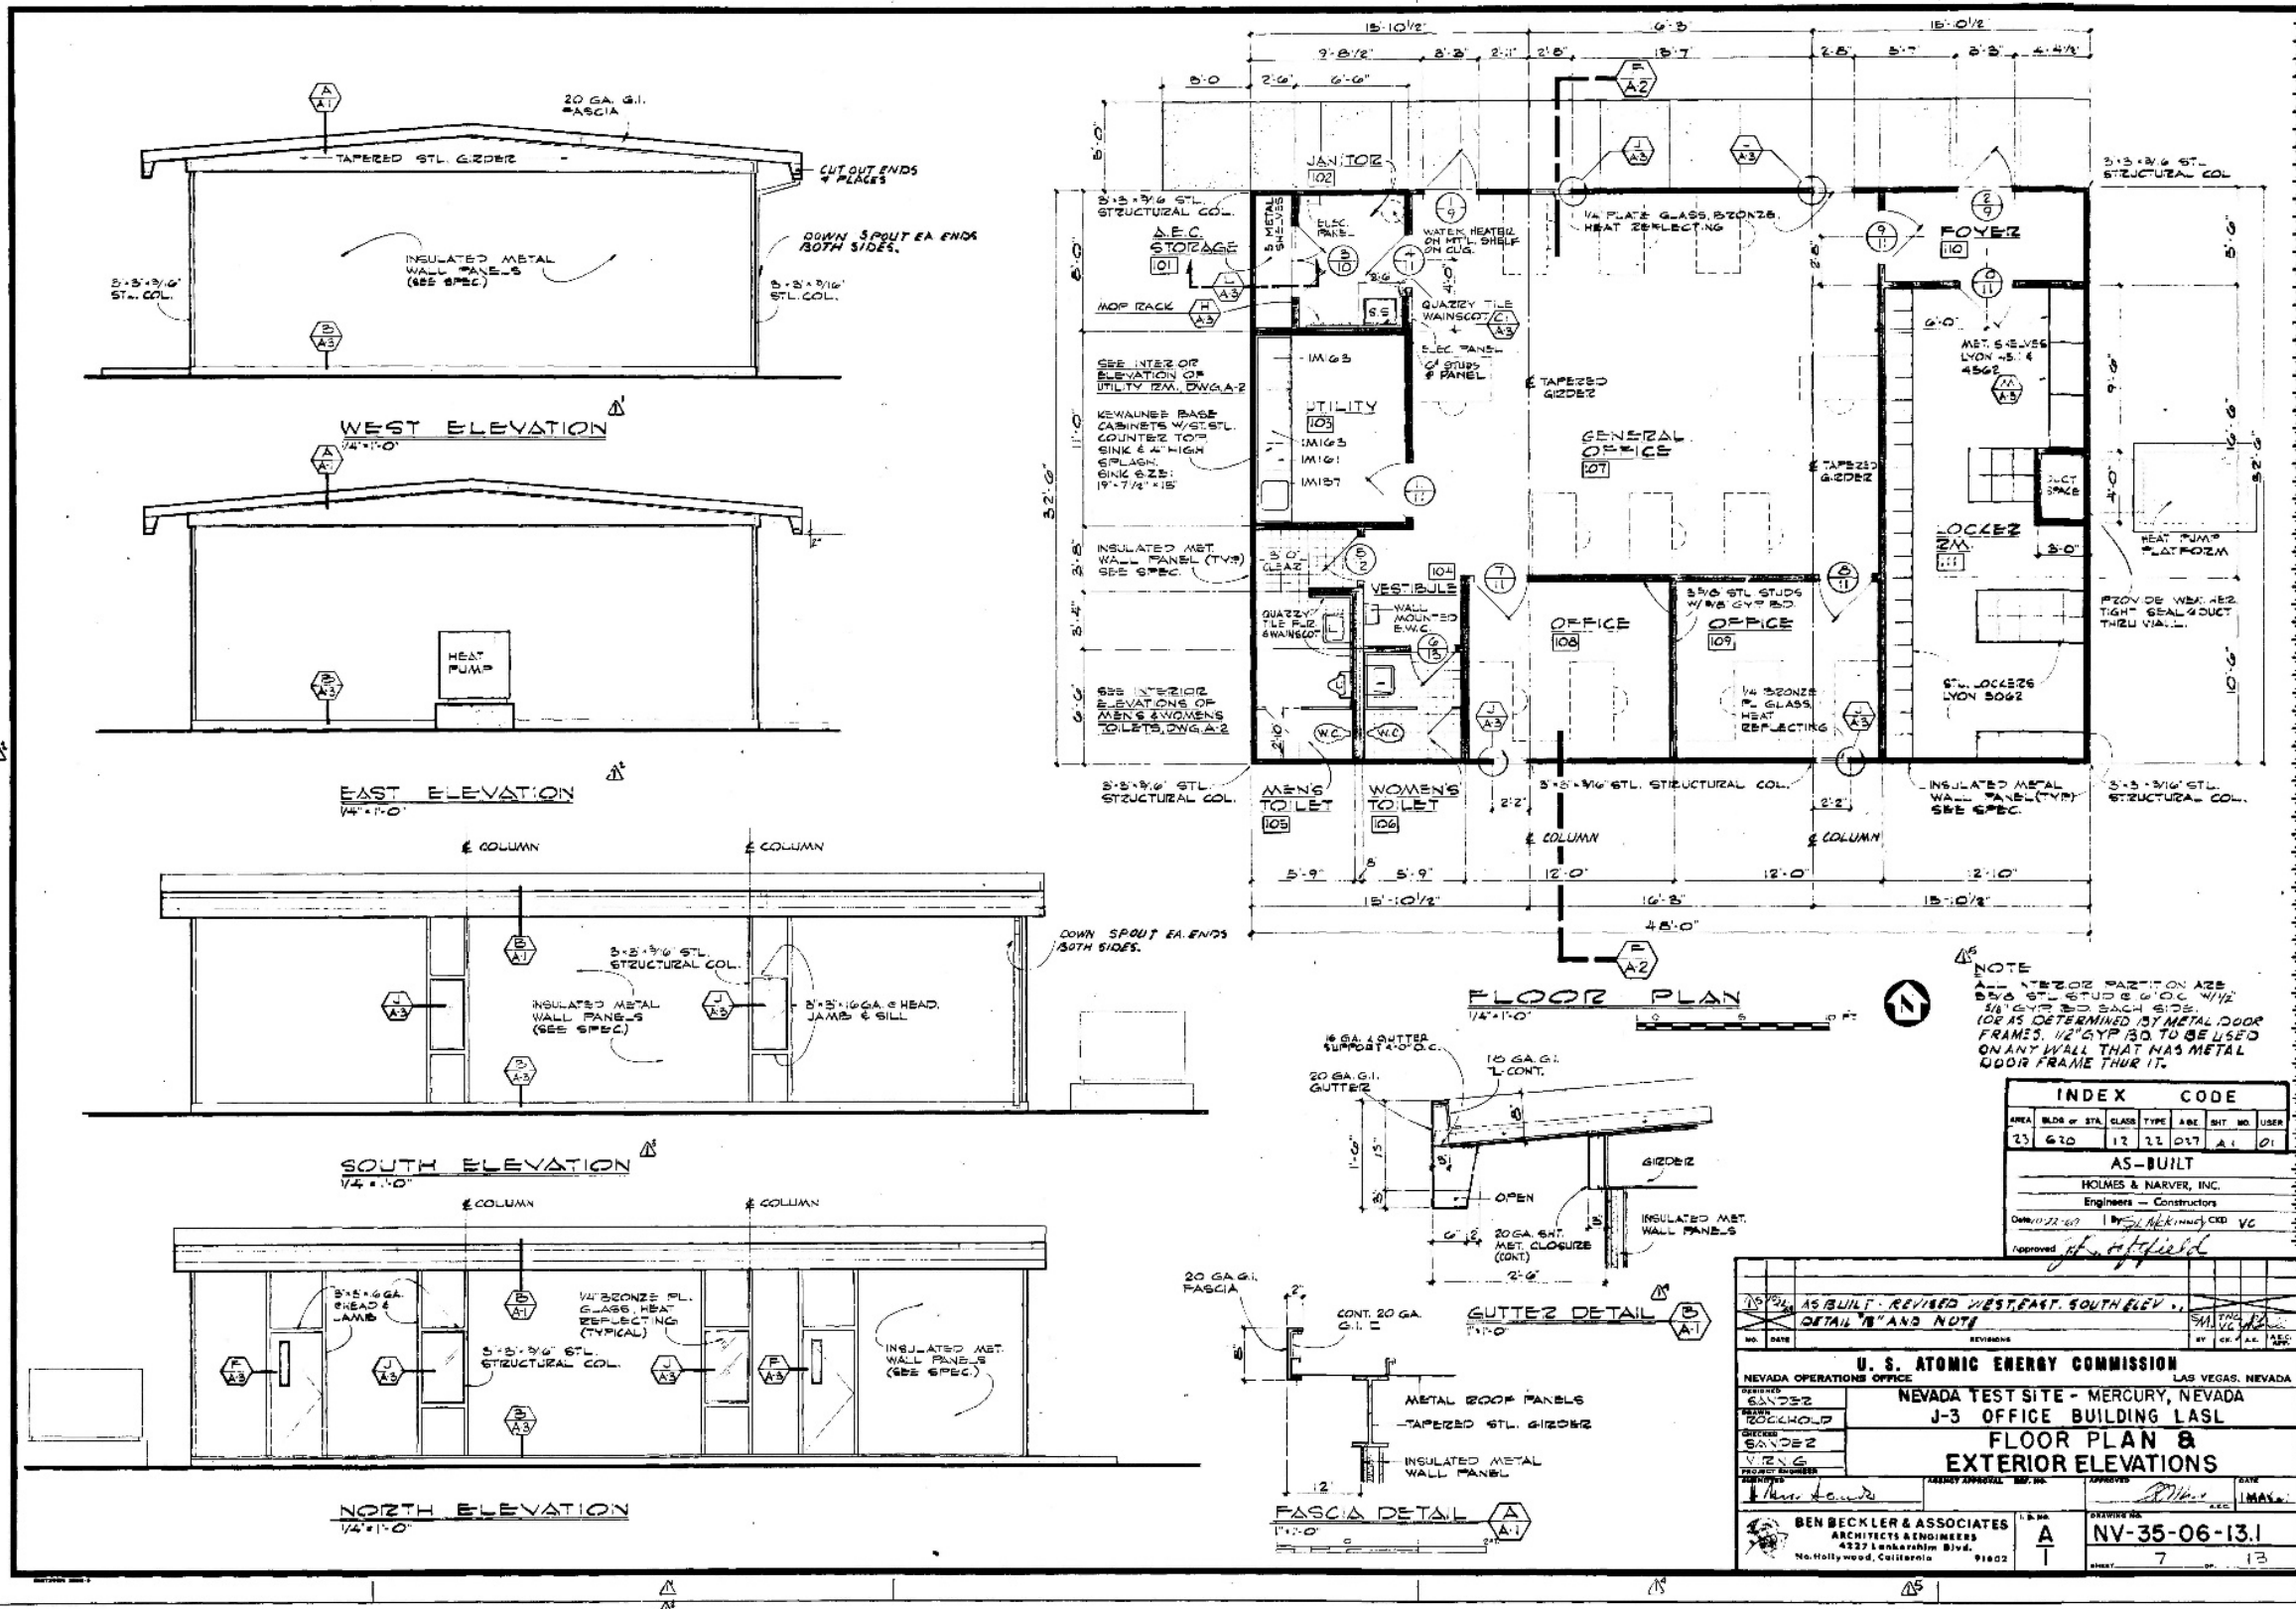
Plan and exterior elevations of Building 23-620, 1969 (H&N 1969).
